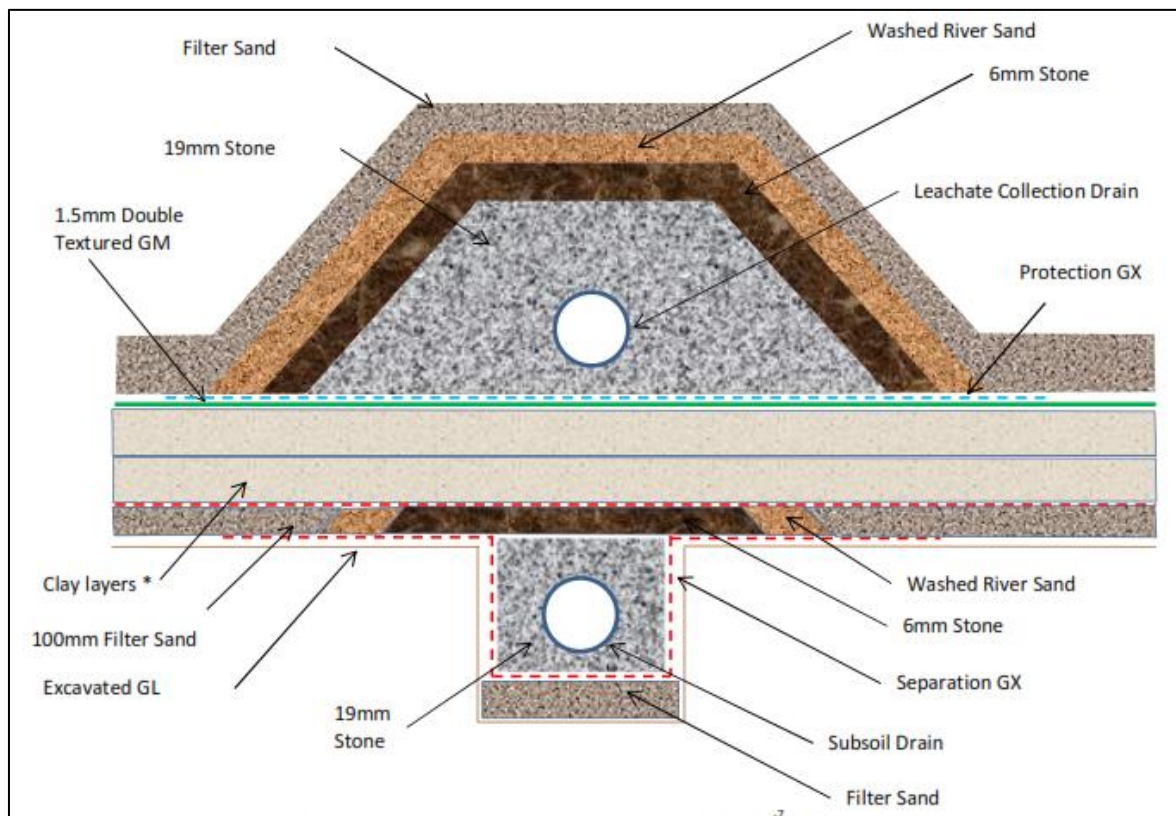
Barrier system applied to site conditions showing leachate and sub-soil conditions
